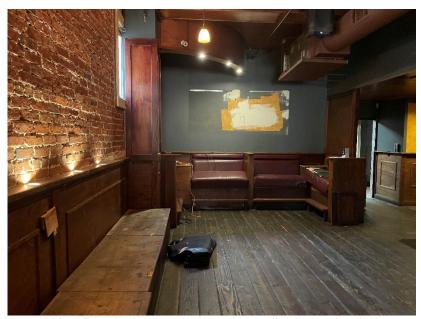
View of first floor, looking north along west wall. (Photo taken by P&T 03/14/2025)
